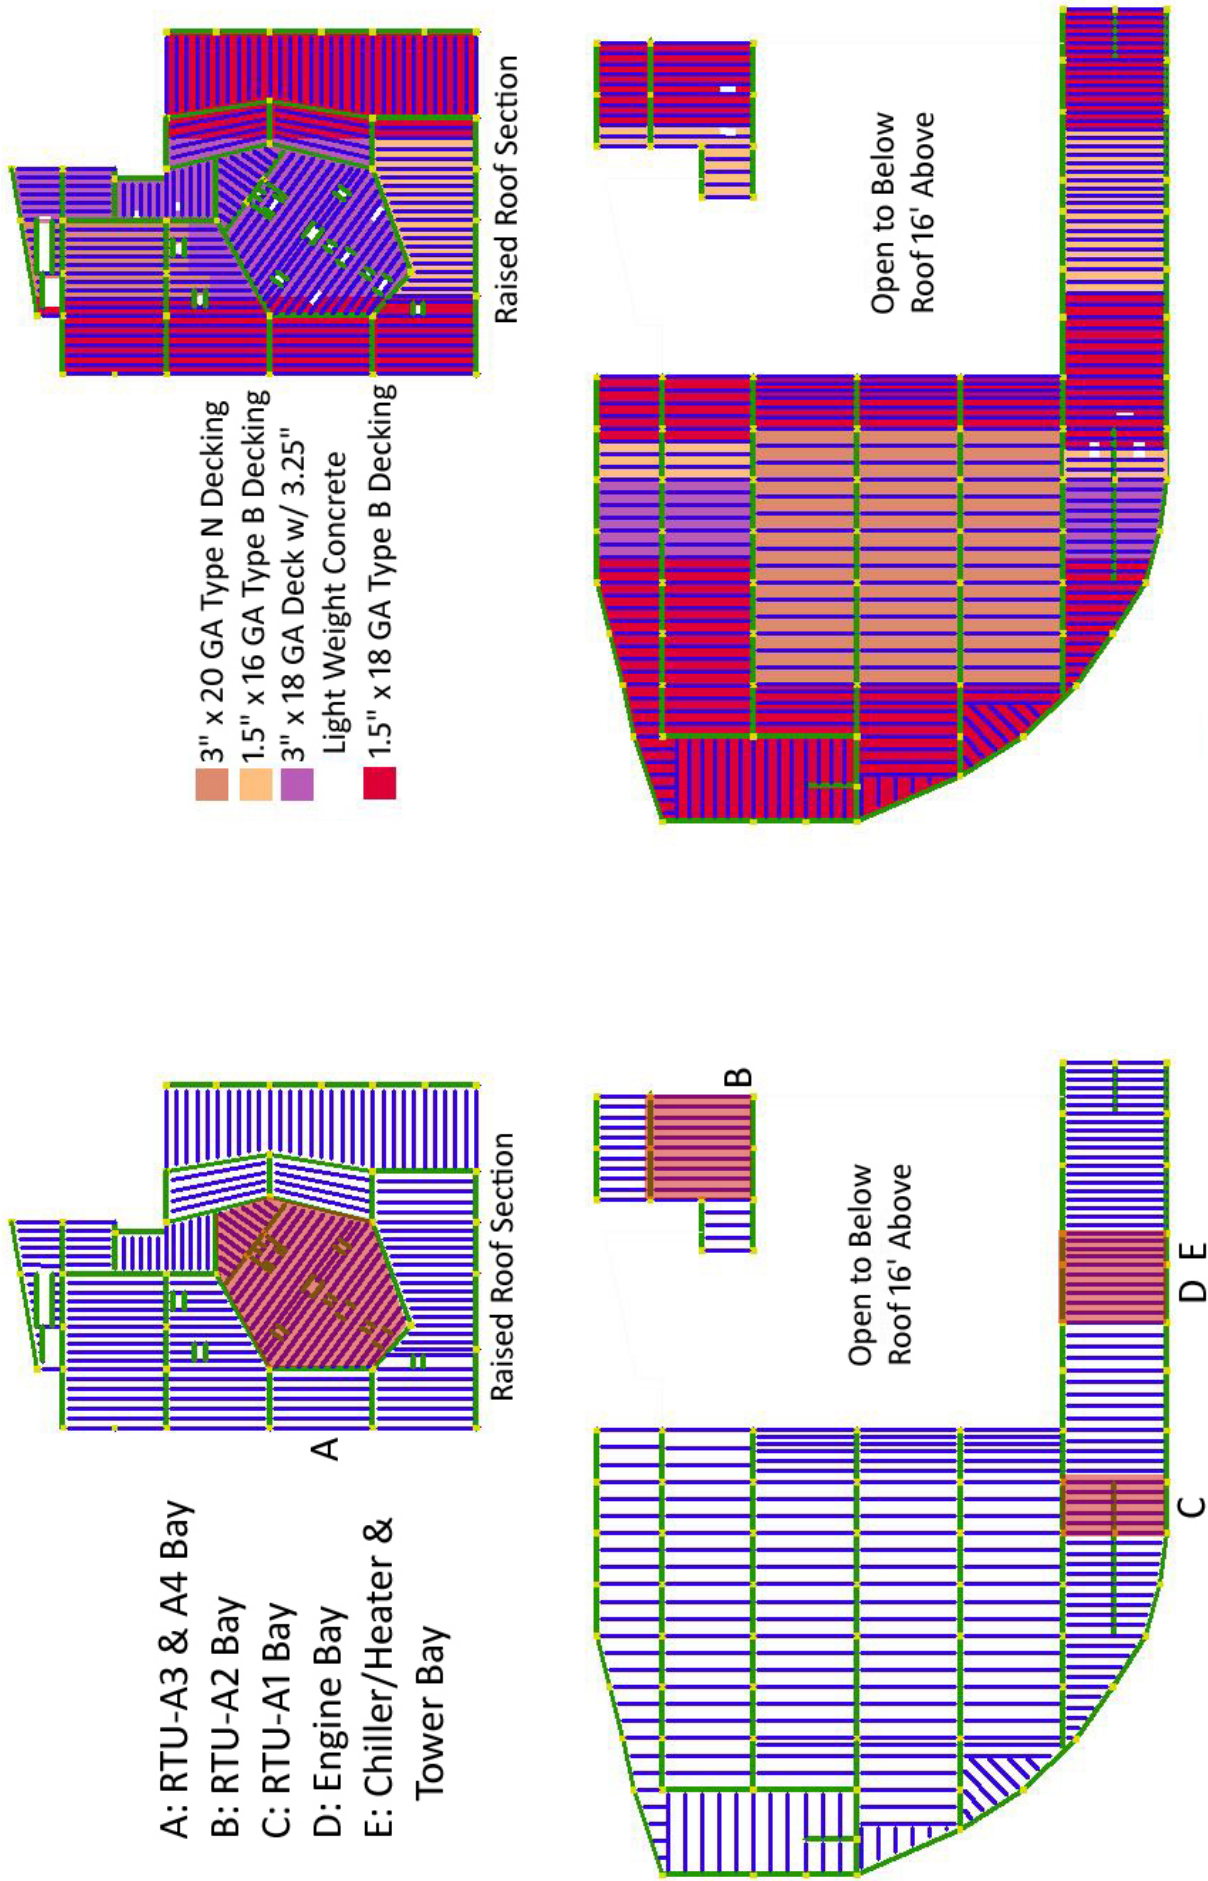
on the previous page shows the layout of the structural system on the retail's section roof. In the figure the green lines represent girders while the blue lines represent joists and the yellow boxes represent columns. The majority of the roof is at an elevation of 71 feet, however, the section of roof over the atrium is raised to an elevation of 91 feet. The left side of the figure shows the location of bays affected by the mechanical system redesign in red. Bay A, on the raised section of the roof, will support rooftop unit A3 and A4, Bay B will support rooftop unit A2, Bay C will support rooftop unit A1, Bay D will support the Jenbacher Engine, and Bay E will support both the absorption chiller/heater and cooling tower. The right side of the figure shows the varying types of decking on the roof. The majority of the roof is covered with just a roofing membrane, however, some spots have been covered with 3" of lightweight concrete.
